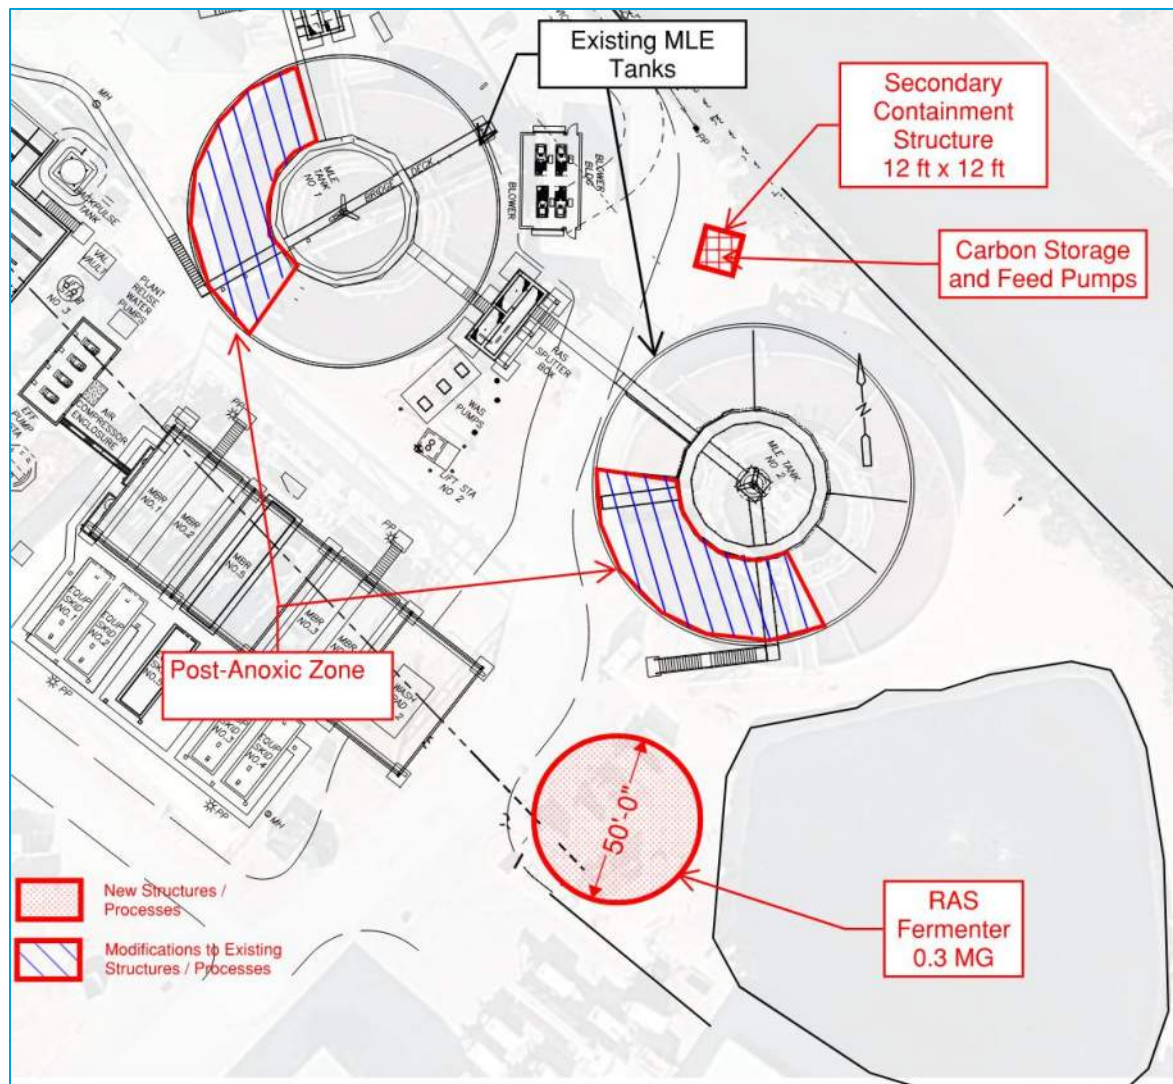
Alternative 1 – Four-Stage Bardenpho + S2EBPR – Proposed Site Layout (proposed shown in red)
